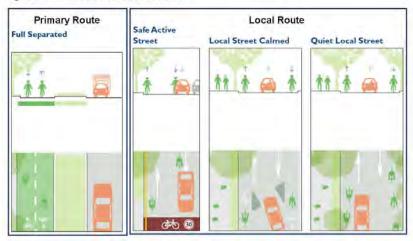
Proposed Bike Facilities in the Town of East Fremantle
